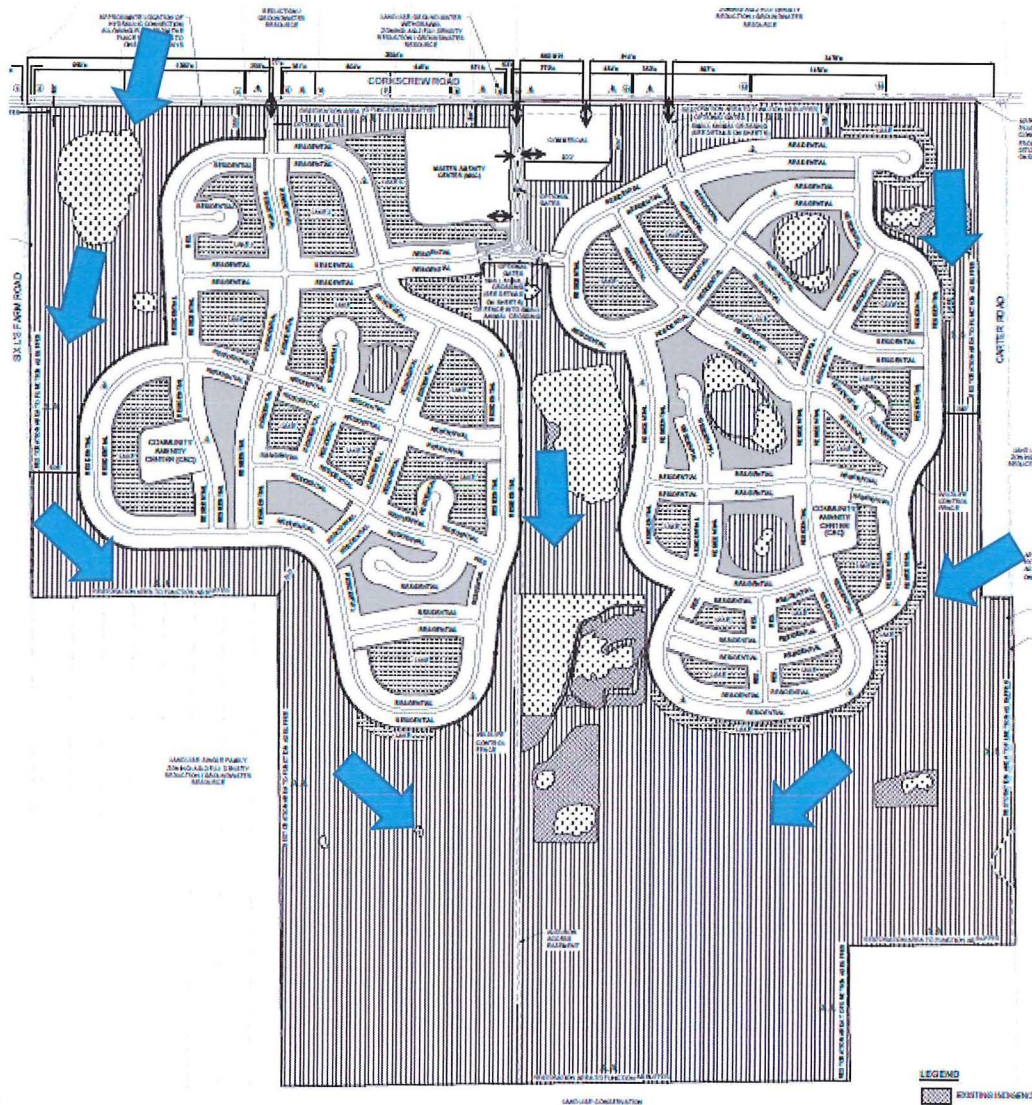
Verdana Village Master Concept Plan – Proposed Flowways
